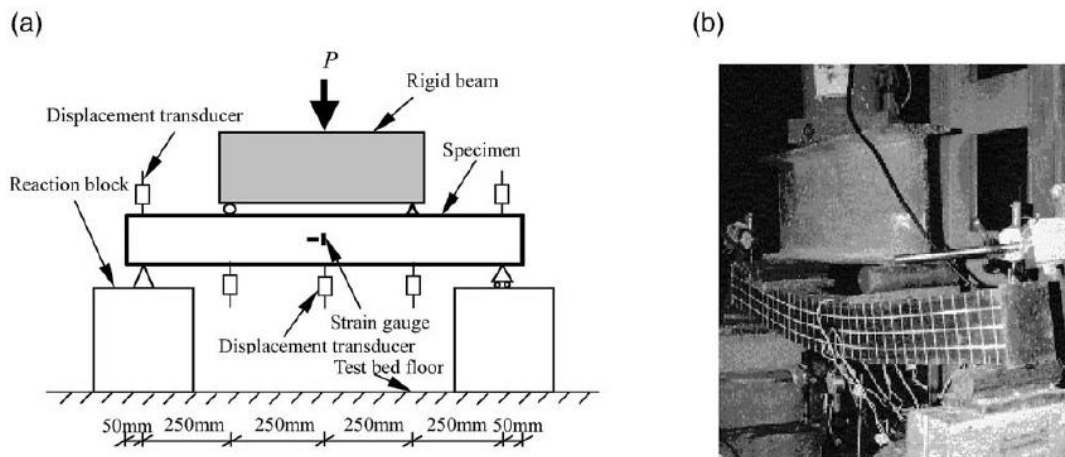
Arrangement of beam test (Source: Lin Hain et al., 2014)
